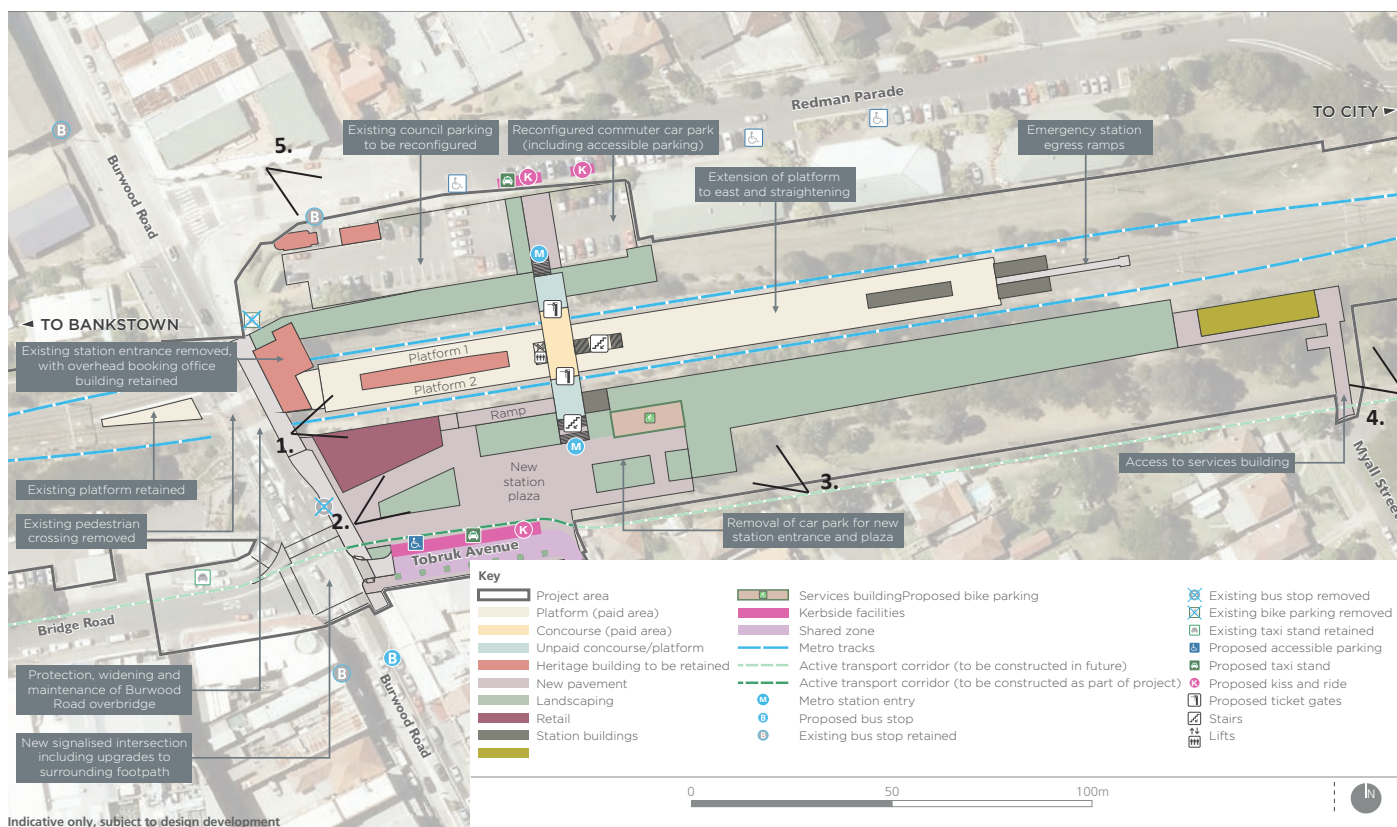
VIEWPOINT LOCATION PLAN
